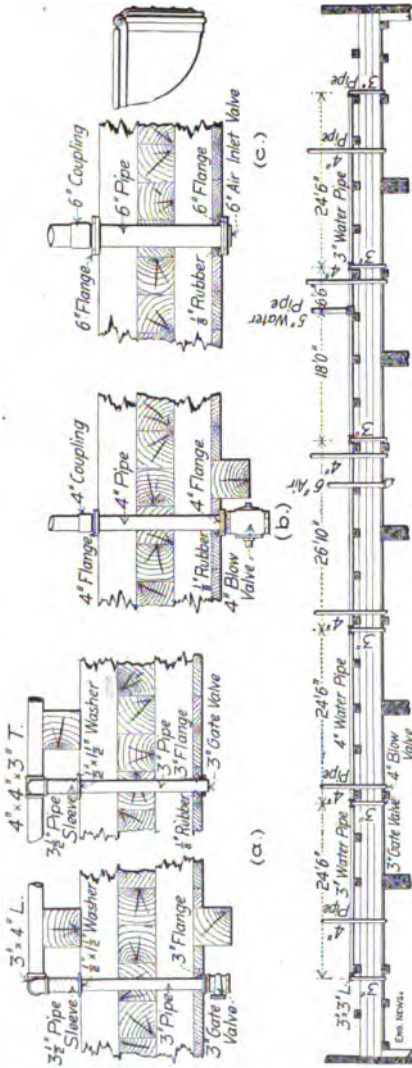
GENERAL DETAILS OF PIPE OPENINGS IN DECK OF MAIN PIER CAISSONS.
